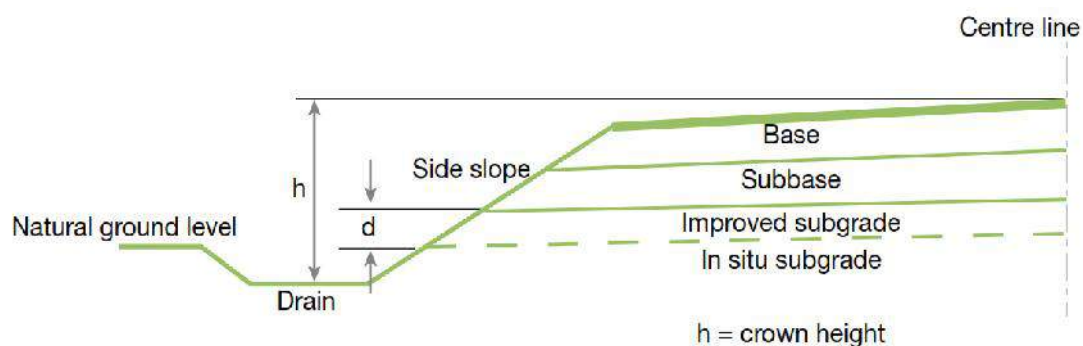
Crown height for paved road in relation to depth of drainage ditch
